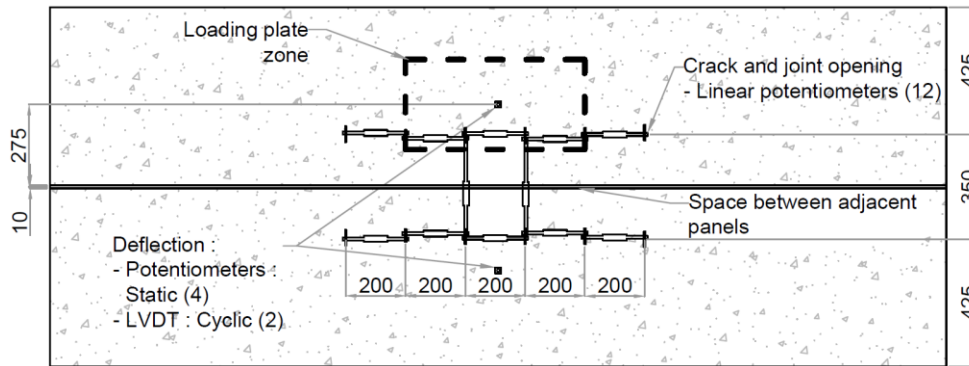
View of the specimen bottom face with instrumentation (dimensions in mm)
